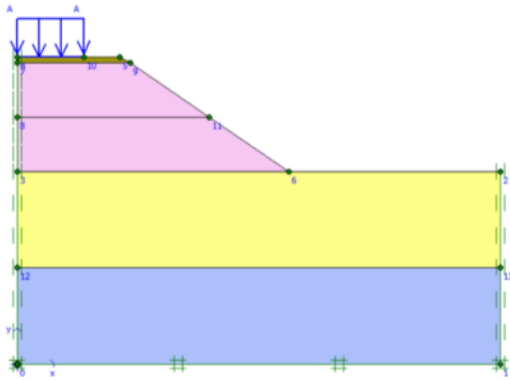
Geometrical model with road construction embankment without deep soil mixing treatment (for control model)
